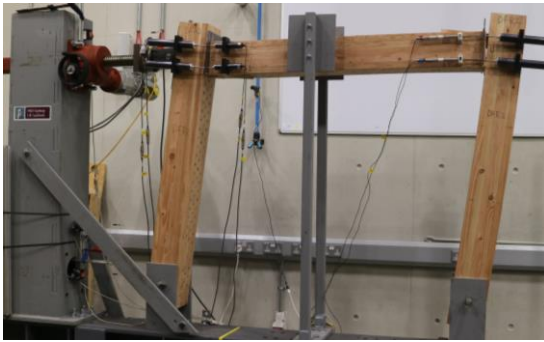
Racking test on adhesive-free, non-metallic timber frame [NUI Galway].
